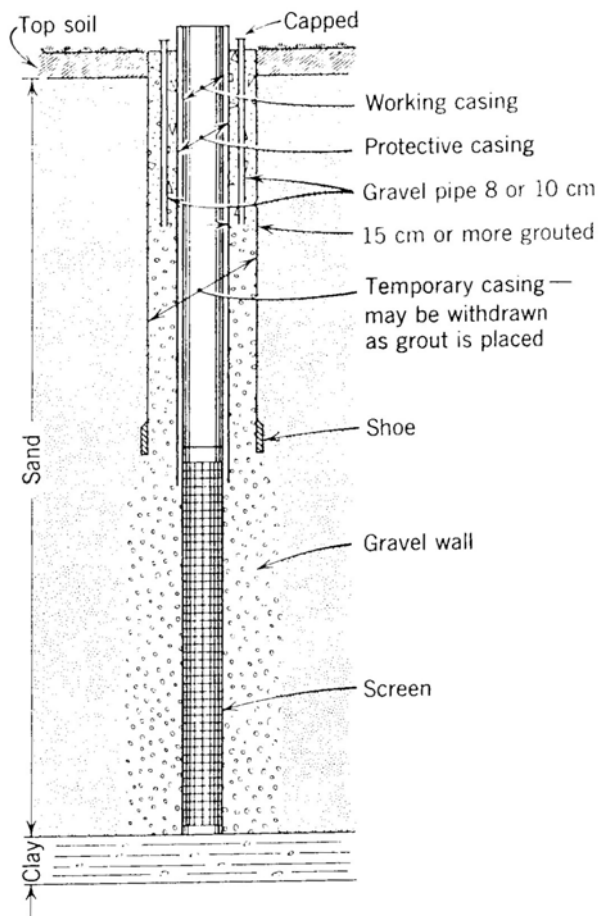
Vertical Cross-section of a Gravel-packed Well
